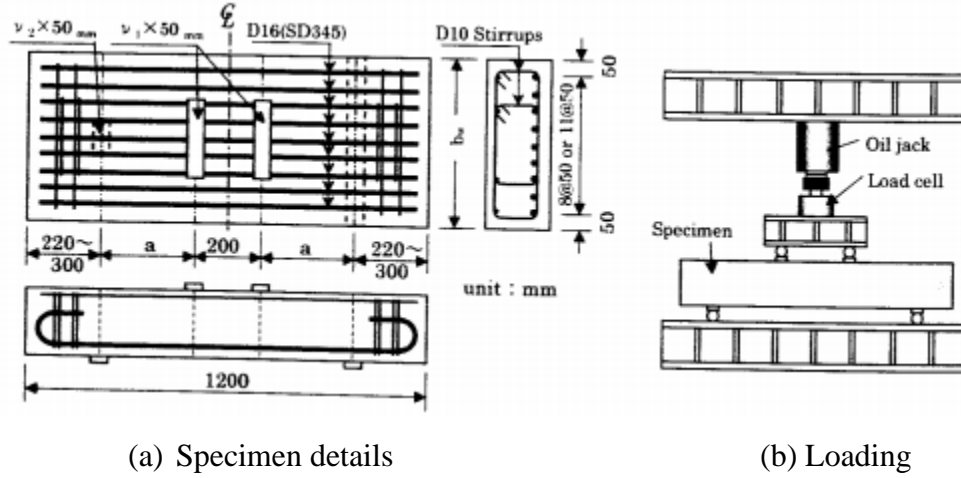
Typical slab specimens (Furuuchi et al. 1998)
